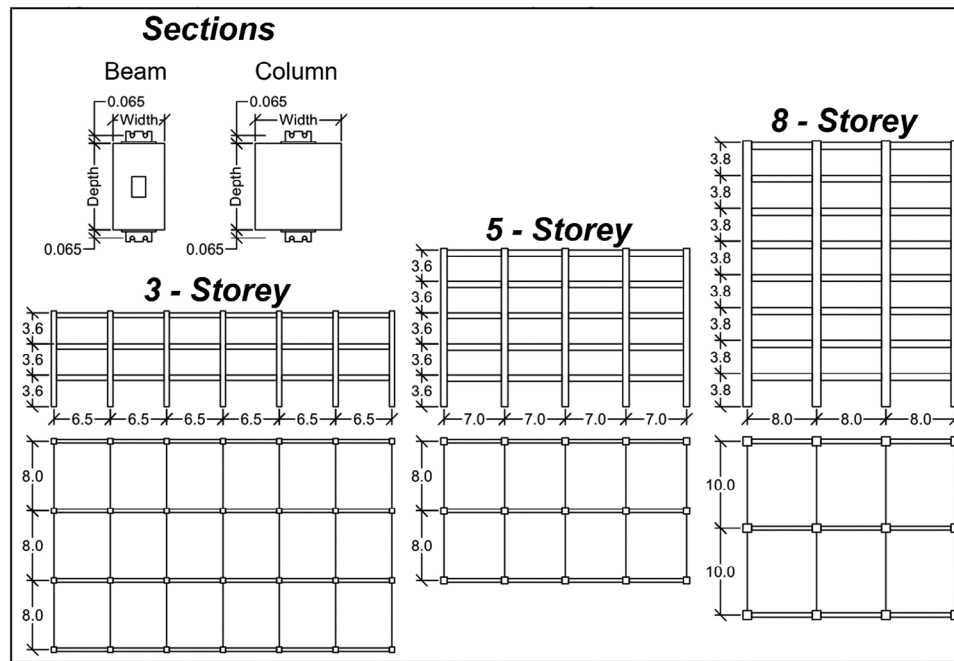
Plan view of the floors, lateral view of the frames, and sketch of components' sections (note: units are in meters).
